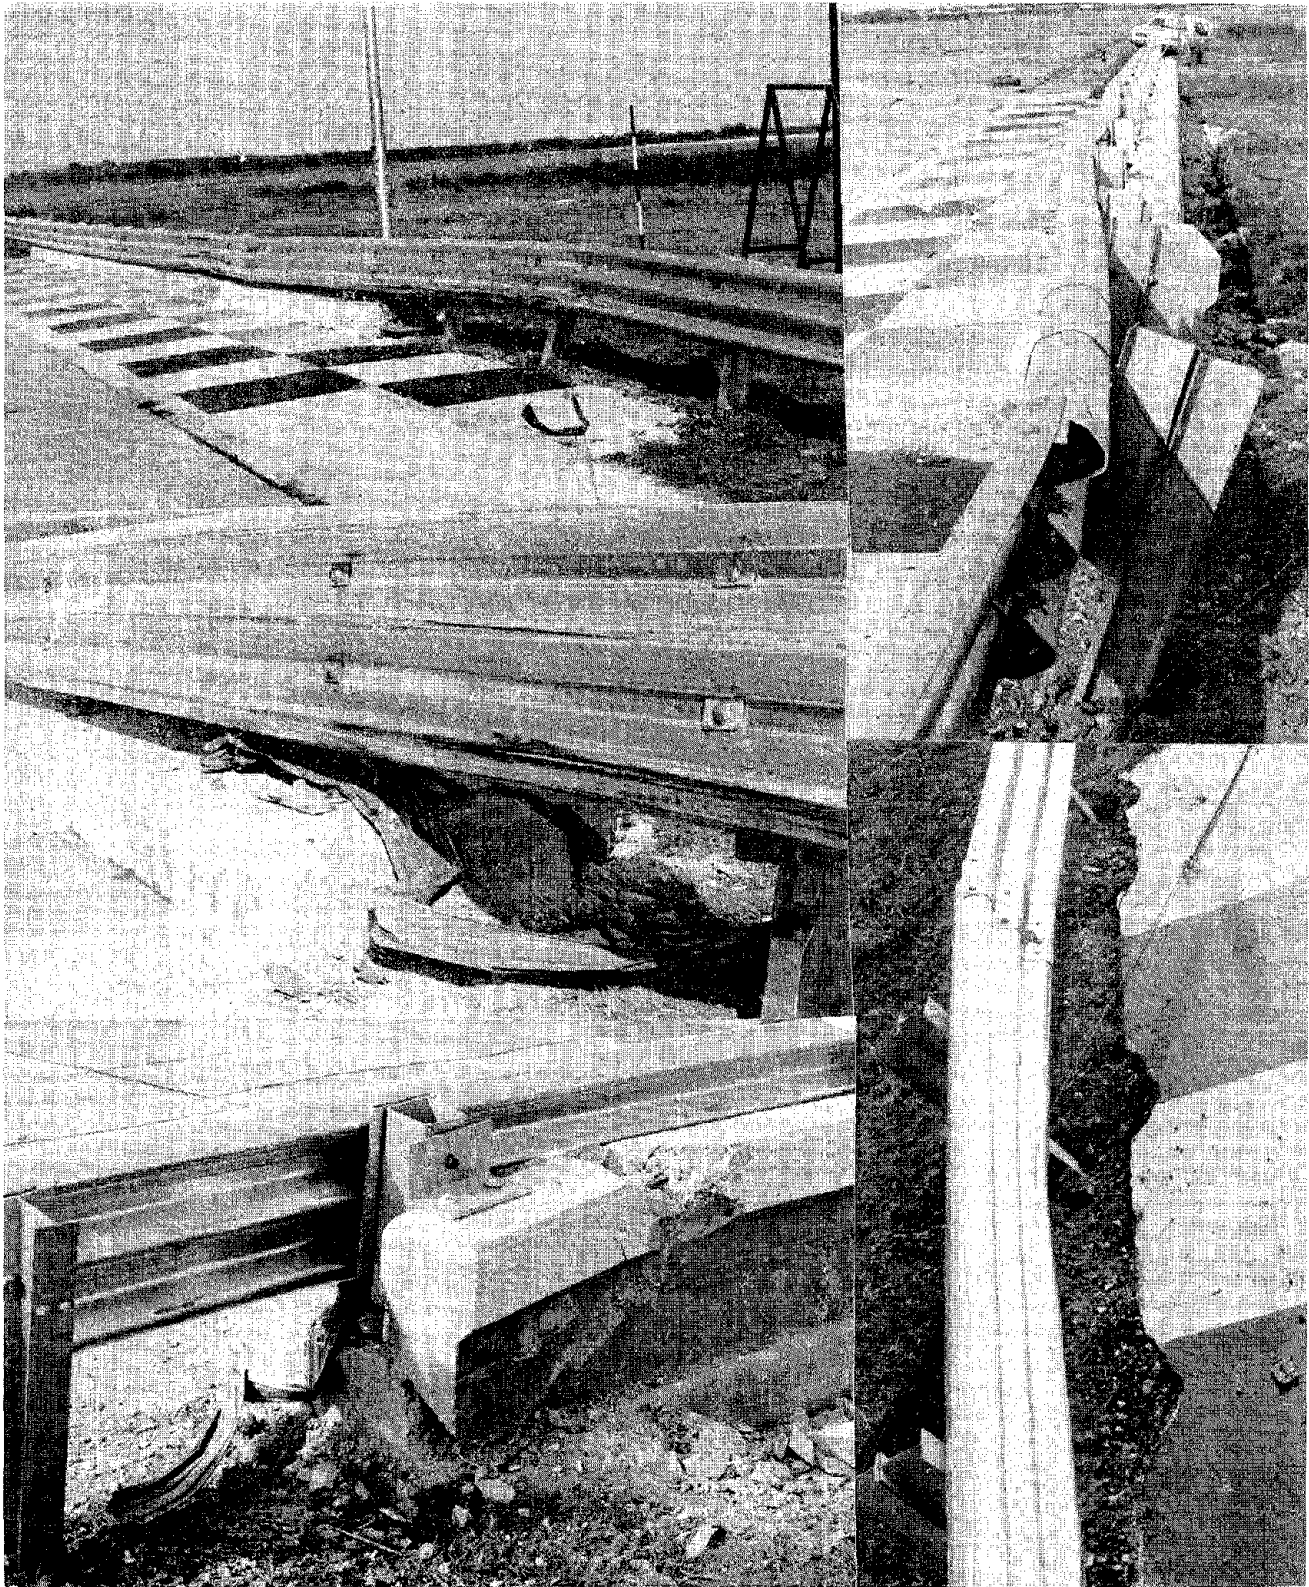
VIEWS OF TEST RF-13 INSTALLATION DAMAGE
